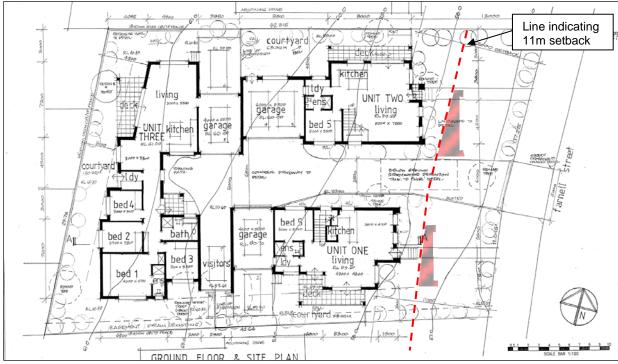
Originally submitted site plan of the development showing a significant portion of the building footprint encroaching the 11m setback to the front boundary. 'Red' hatching indicates extent of encroachment.
